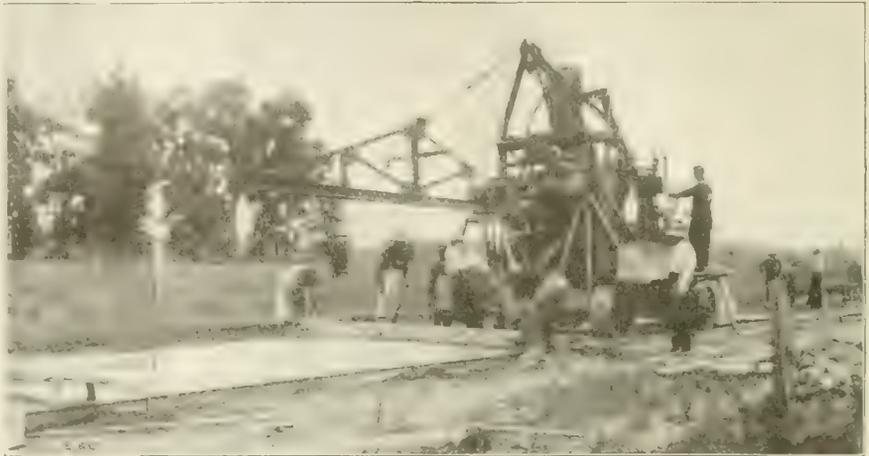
Mixing and Placing Concrete. Note Steel Side Forms and Method of Finishing Surface.
